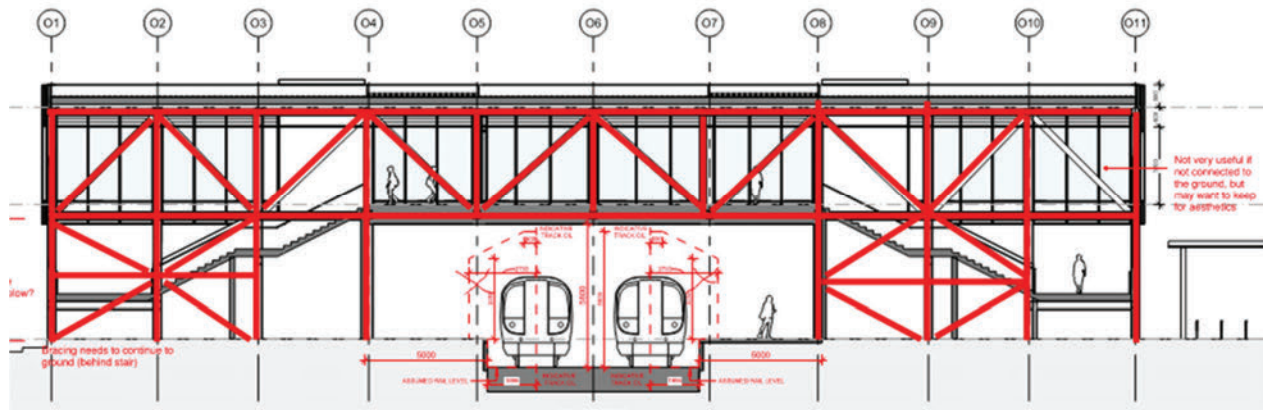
Elevation of Bridge Showing Proposed Truss Arrangement
